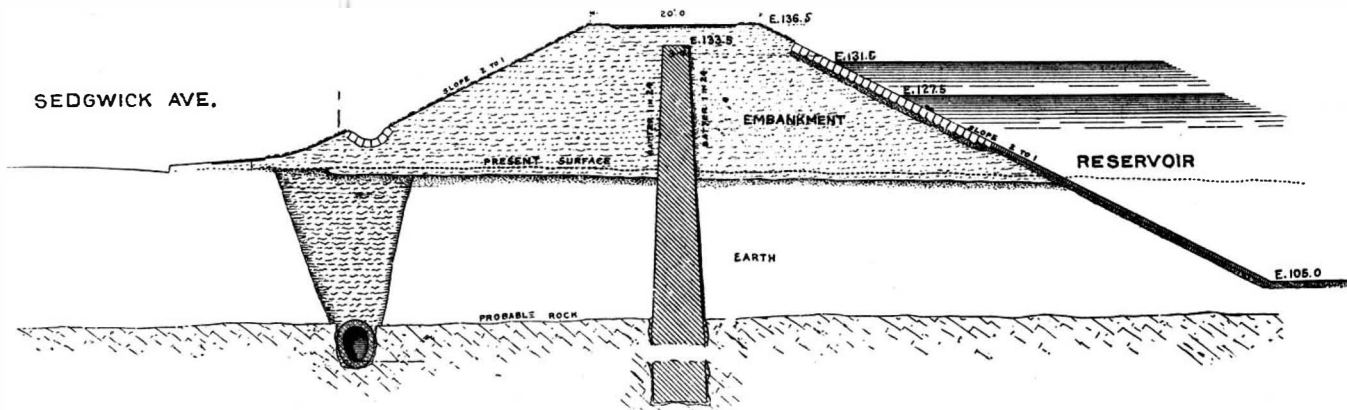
TYPICAL SECTION OF RESERVOIR EMBANKMENT.
